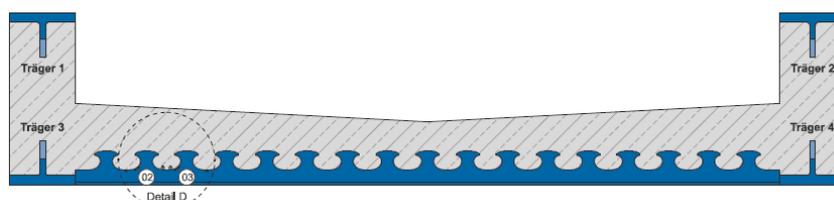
Cross section VFT-Rail with composite dowels and composite slab
